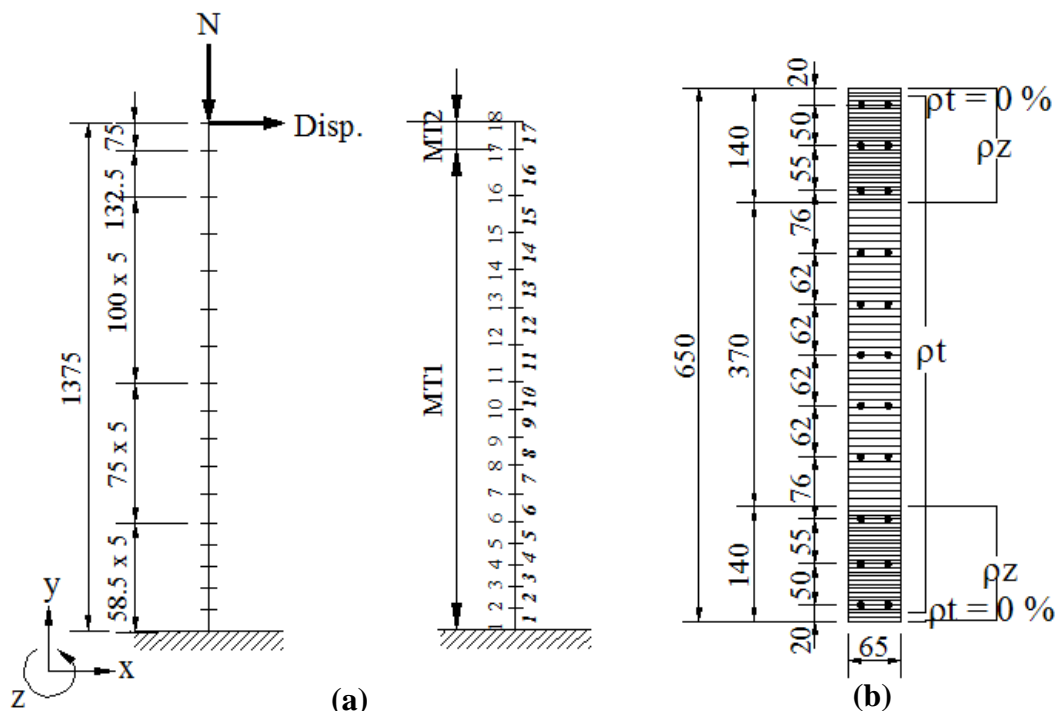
(a) Frame Model for Lefas Walls; (b) Sectional Model
